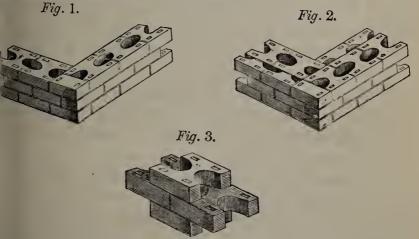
is a representation of a 9-in. wall, built with e ventilating bricks, with one common brick used at e angle of each course.
